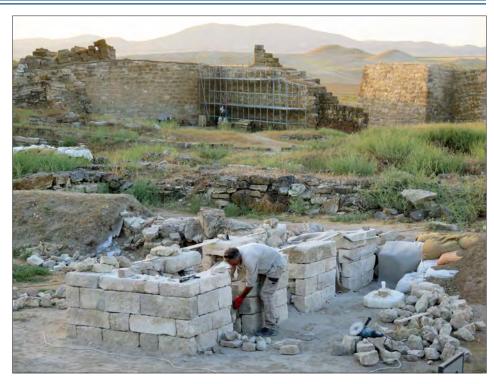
The new stone encasement around the damaged walls of Megaron 3, with the citadel's East Gate at top, looking southeast. Photo by Elisa Del Bono.
